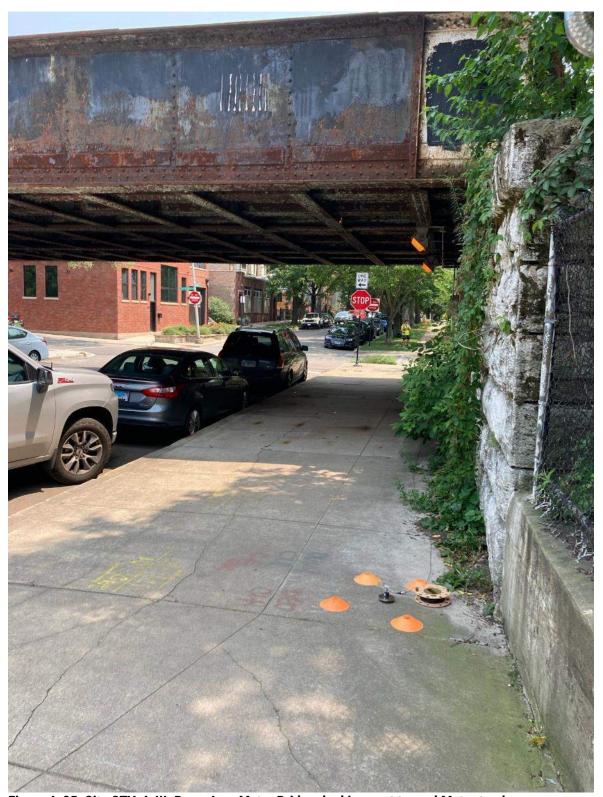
Site STV-4, W. Barry Ave. Metra Bridge, looking east toward Metra tracks
